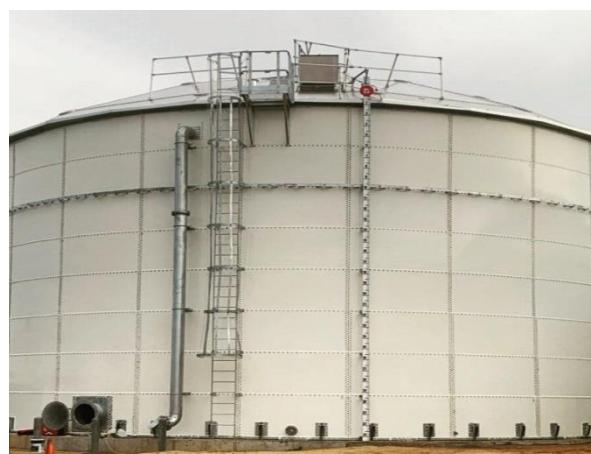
INTERNAL FLOATING ROOF TANKS
